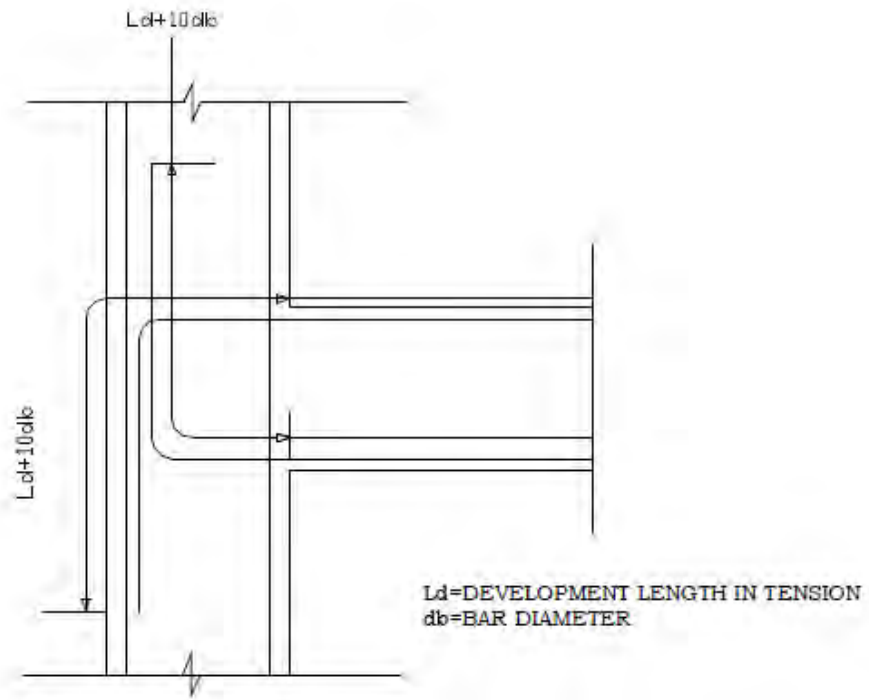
Anchorage of Beam Bars in External Joints (IS 1893 – 2002)
